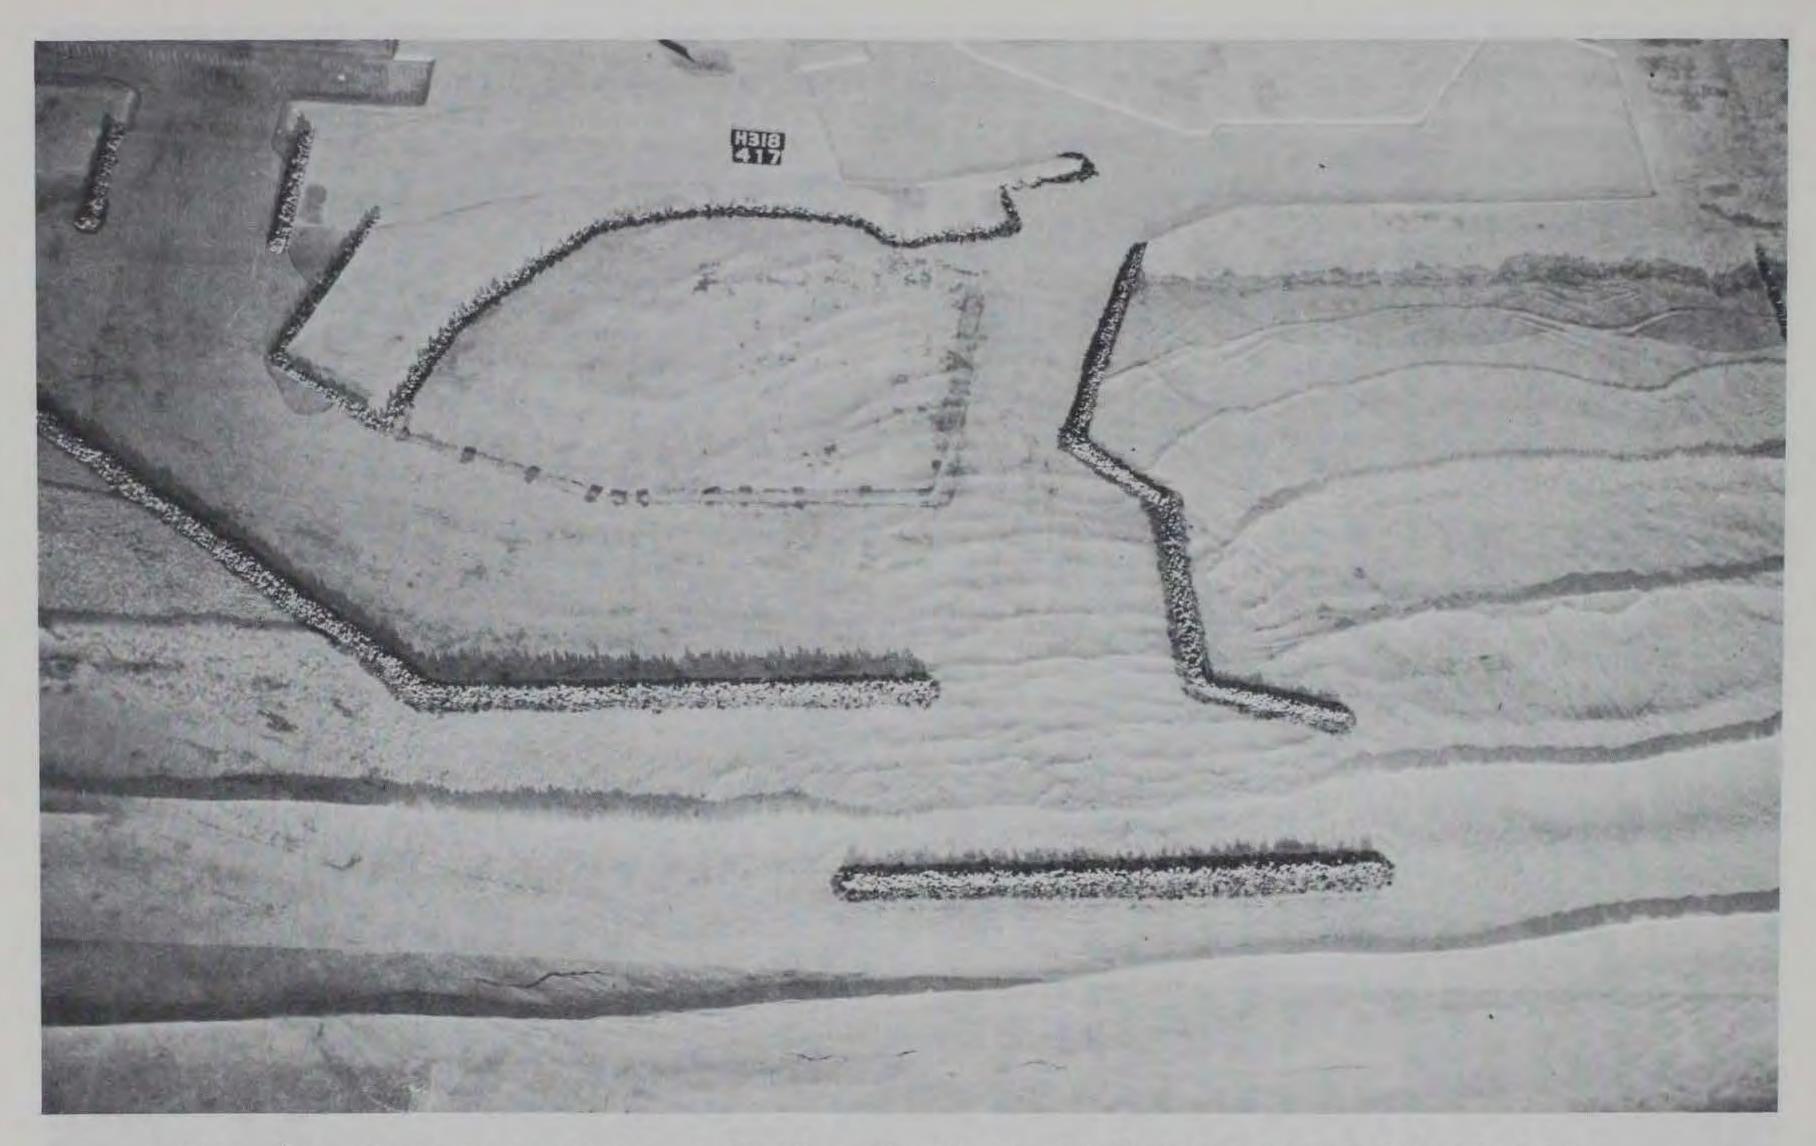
Typical wave patterns for Plan 29; 17-sec, 10-ft waves from southwest at mhhw
